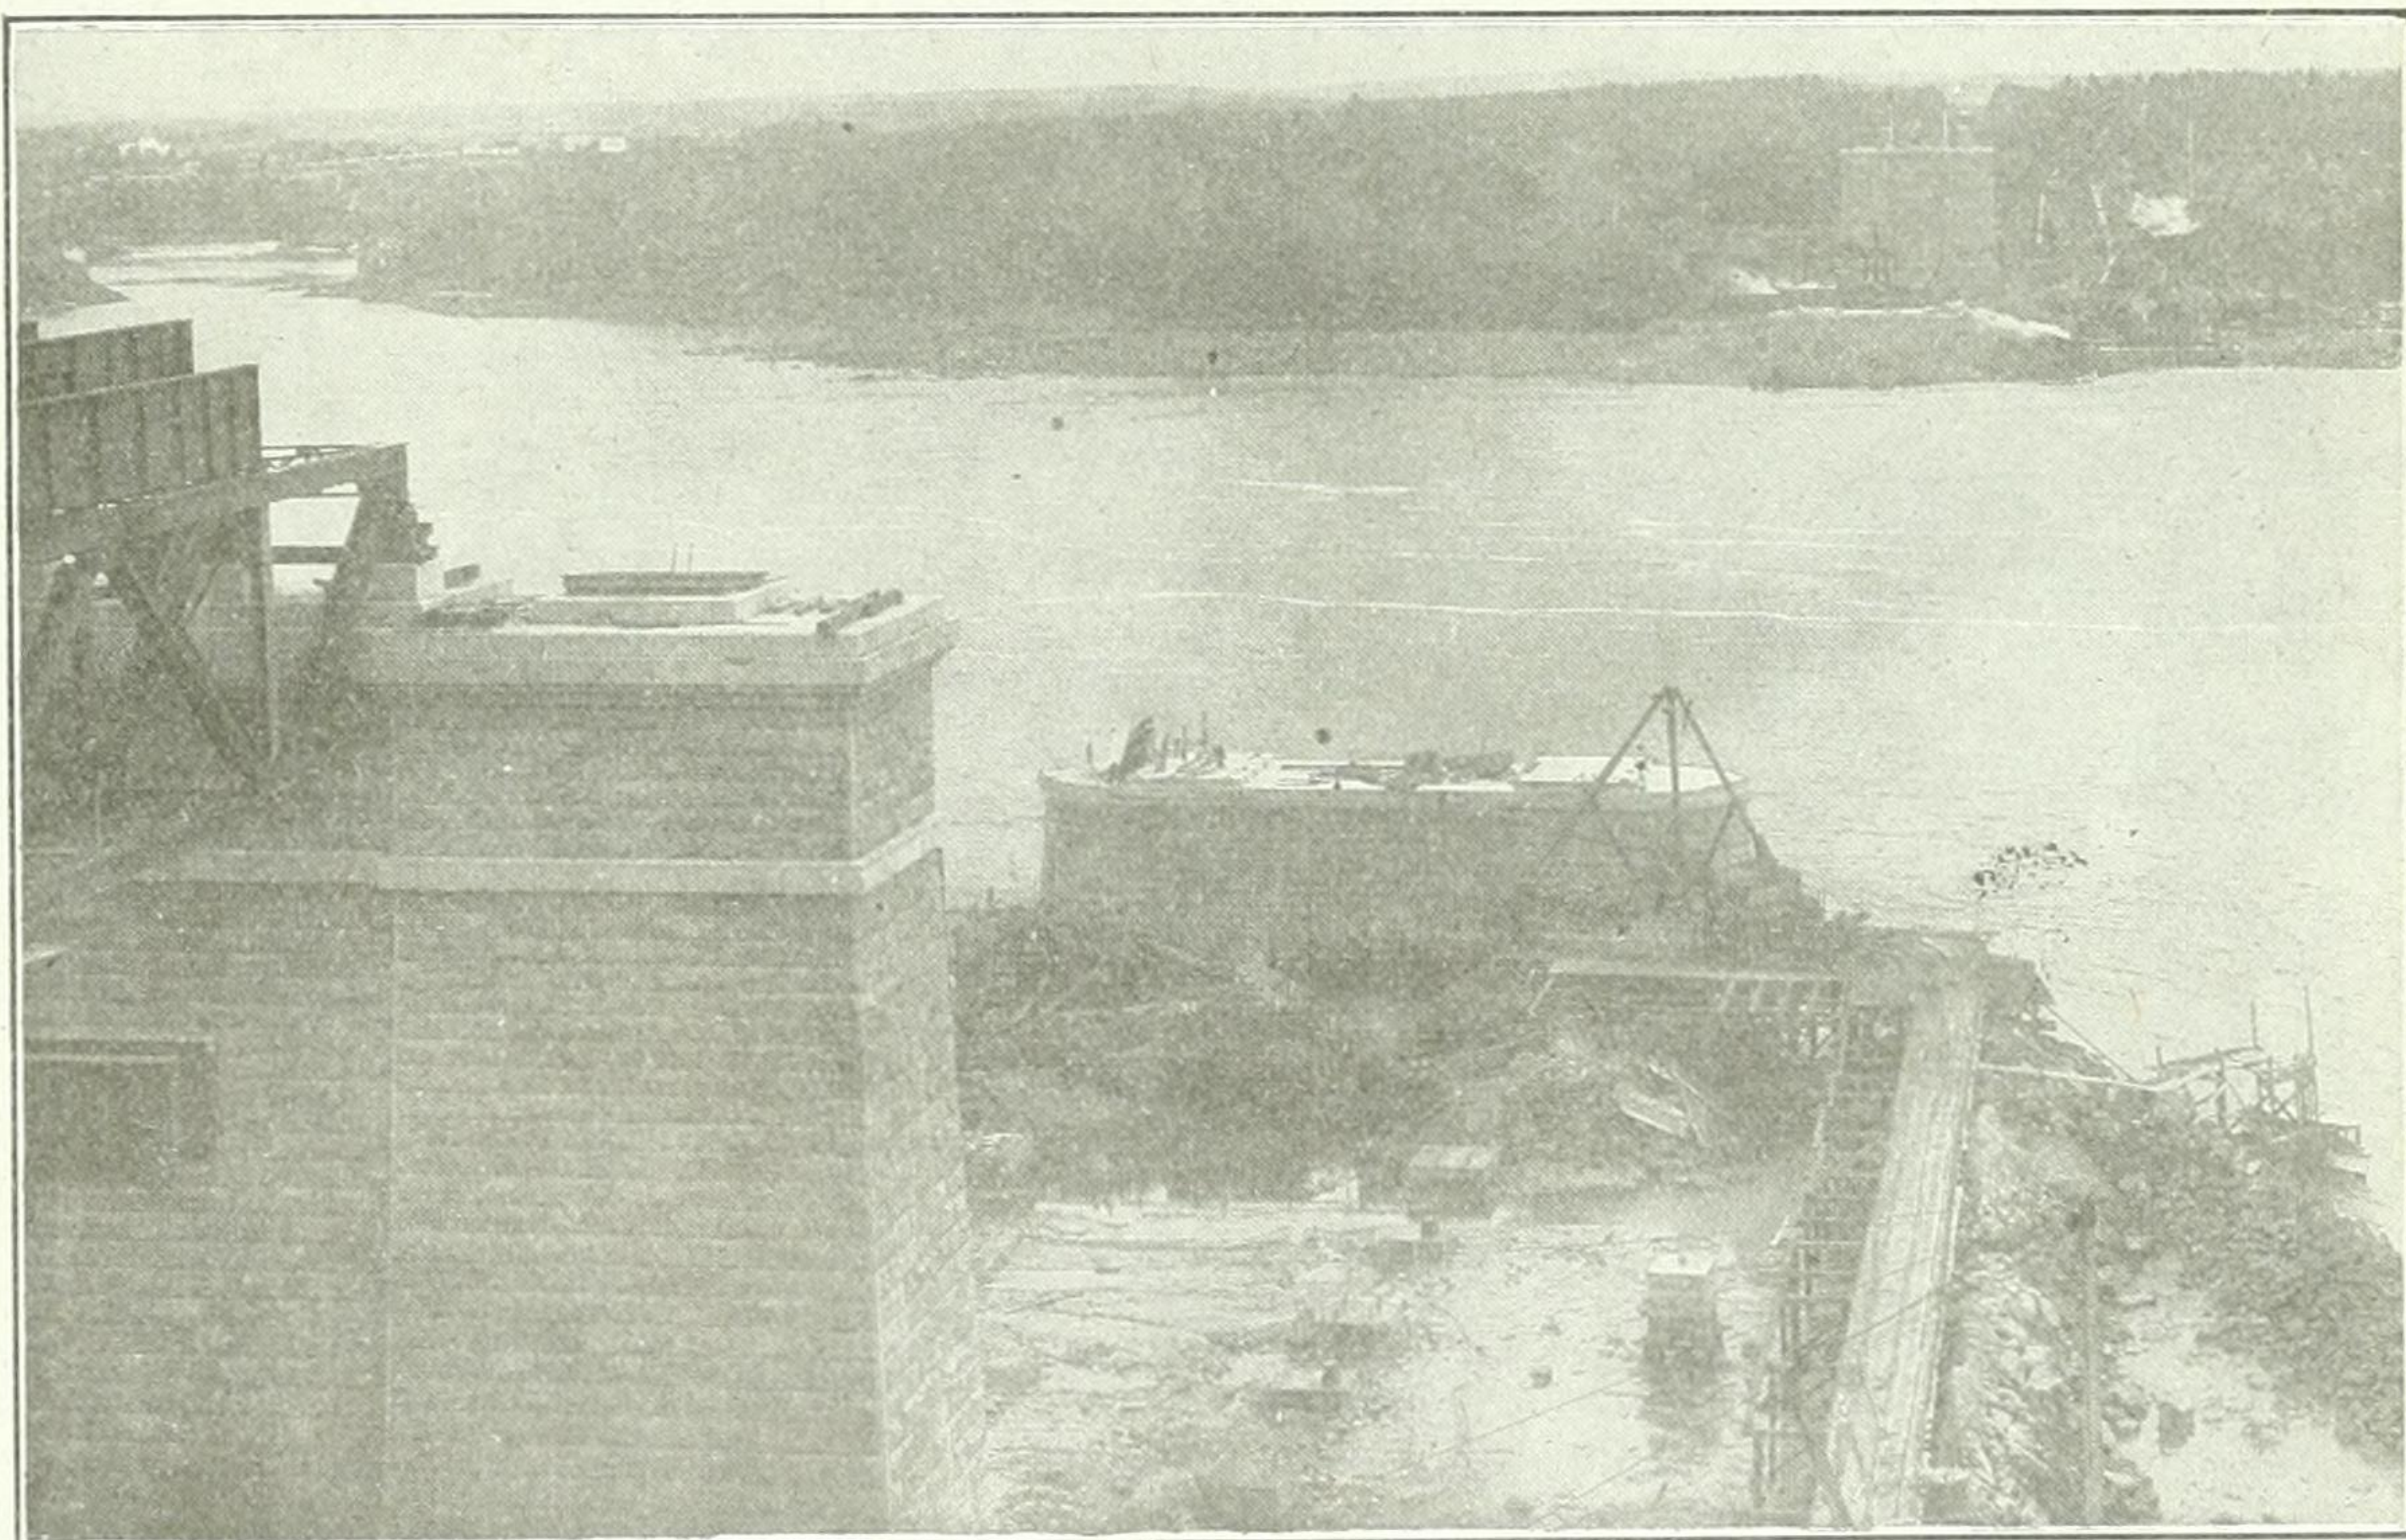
General view of the bridge site from the north shore, showing the completed masonry on both sides of the river.
